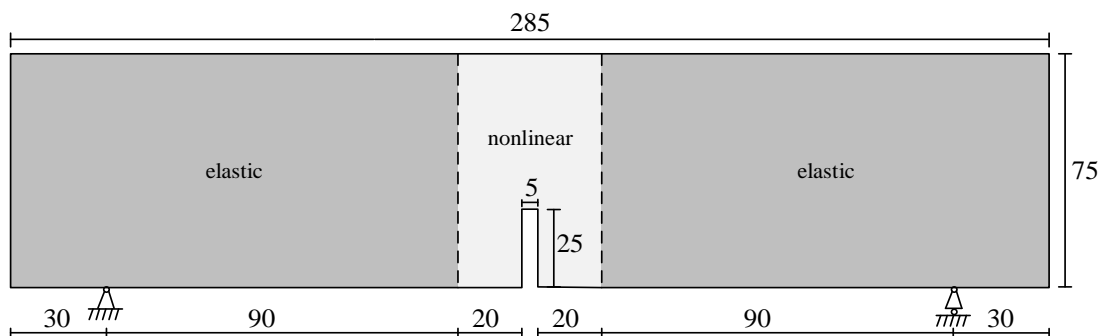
Boundary conditions and dimension details of concrete specimen
